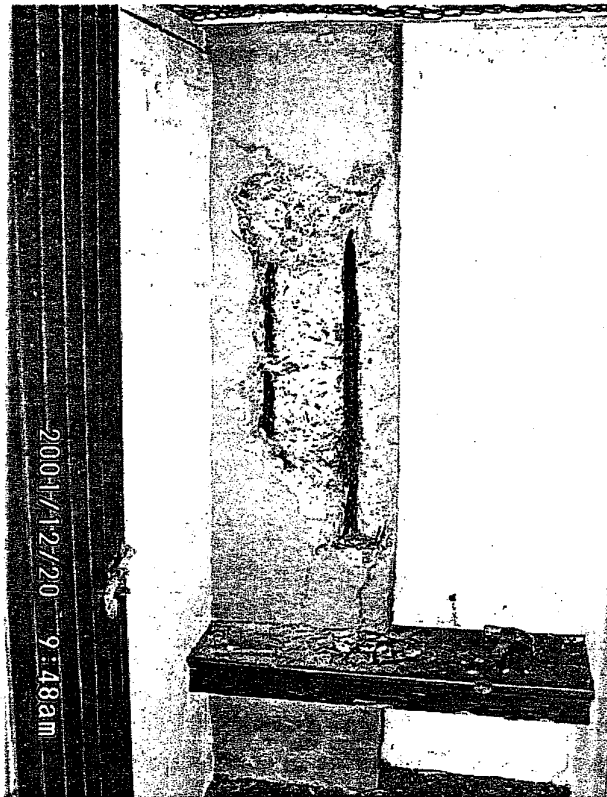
Cracking in column on reverse, associated with low cover
